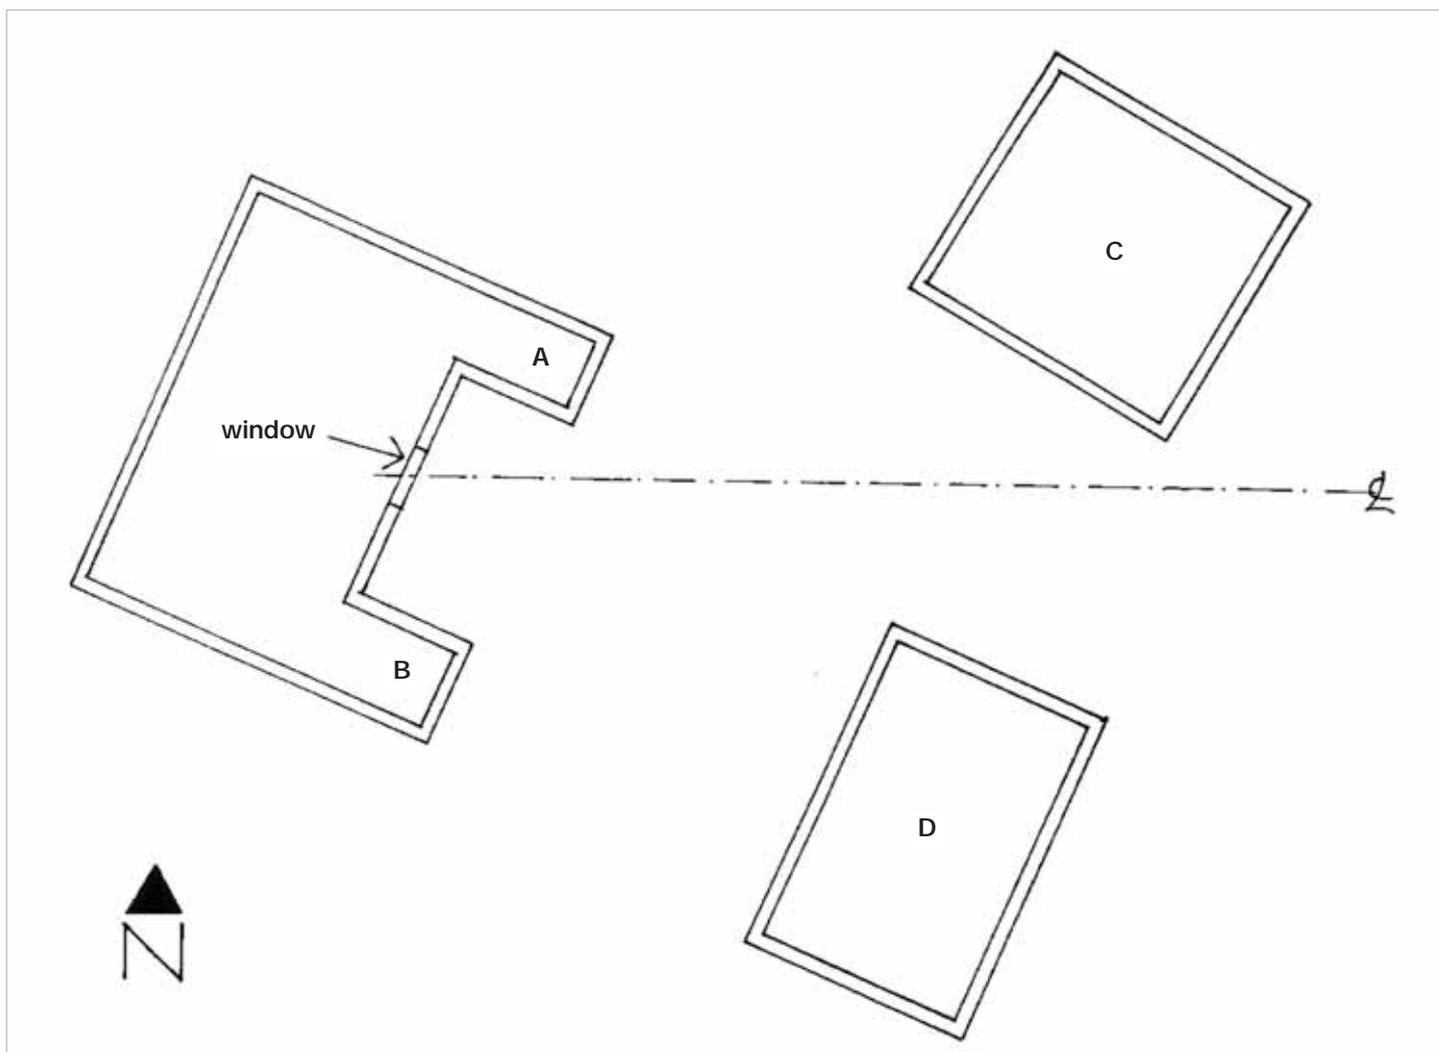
When considering sunlight impact on a window it is only those proposed developments to the south of the window which need to be checked i.e. extension 'B' and new building 'D'. The proposal to the north of the window (extension 'A' and new building 'C') will not affect sunlight.
